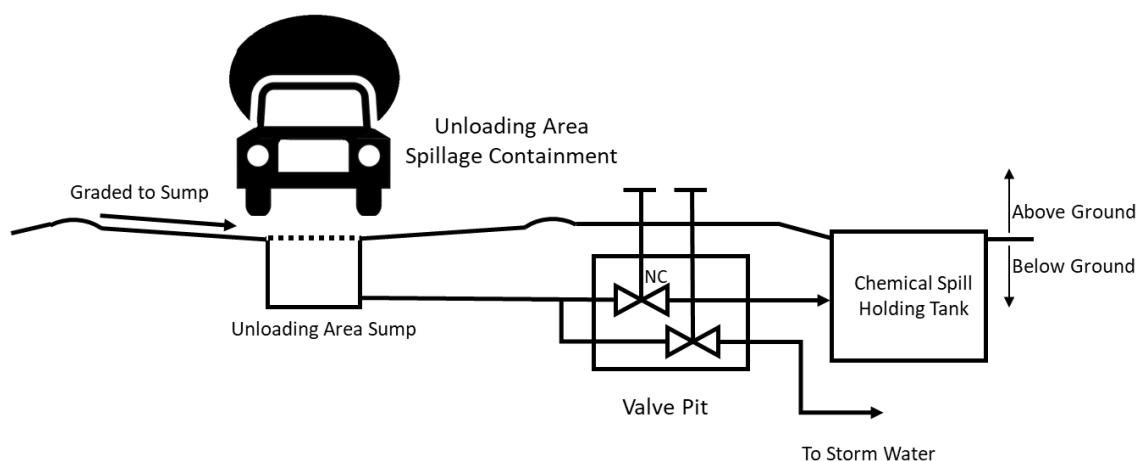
Section view showing unloading bay, sump, and drainage arrangement.
